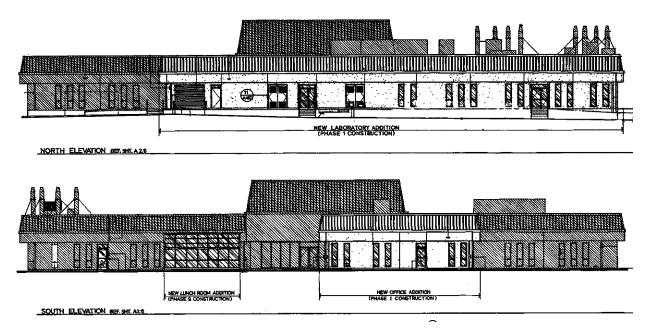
Admin/Lab Buildings – North (top) and South (bottom) Elevations
